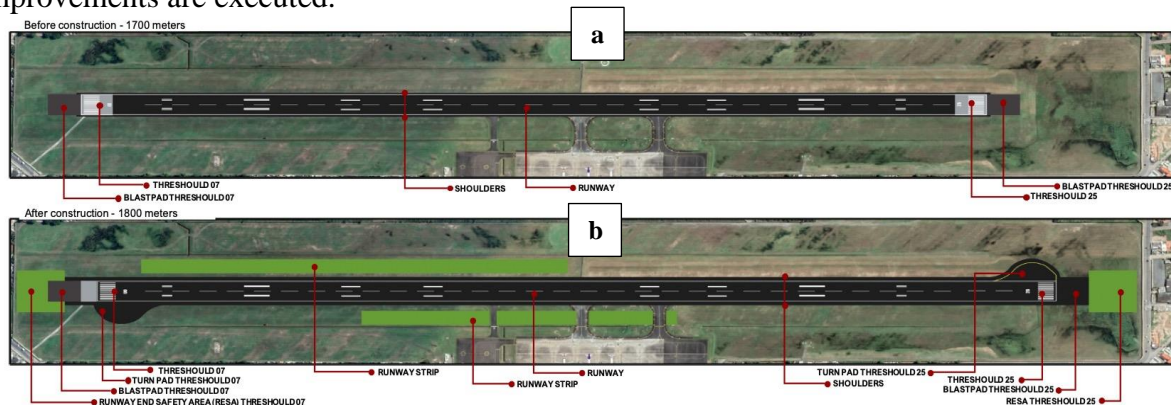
(a) Existing Runway; (b) Runway after the proposed improvements.
